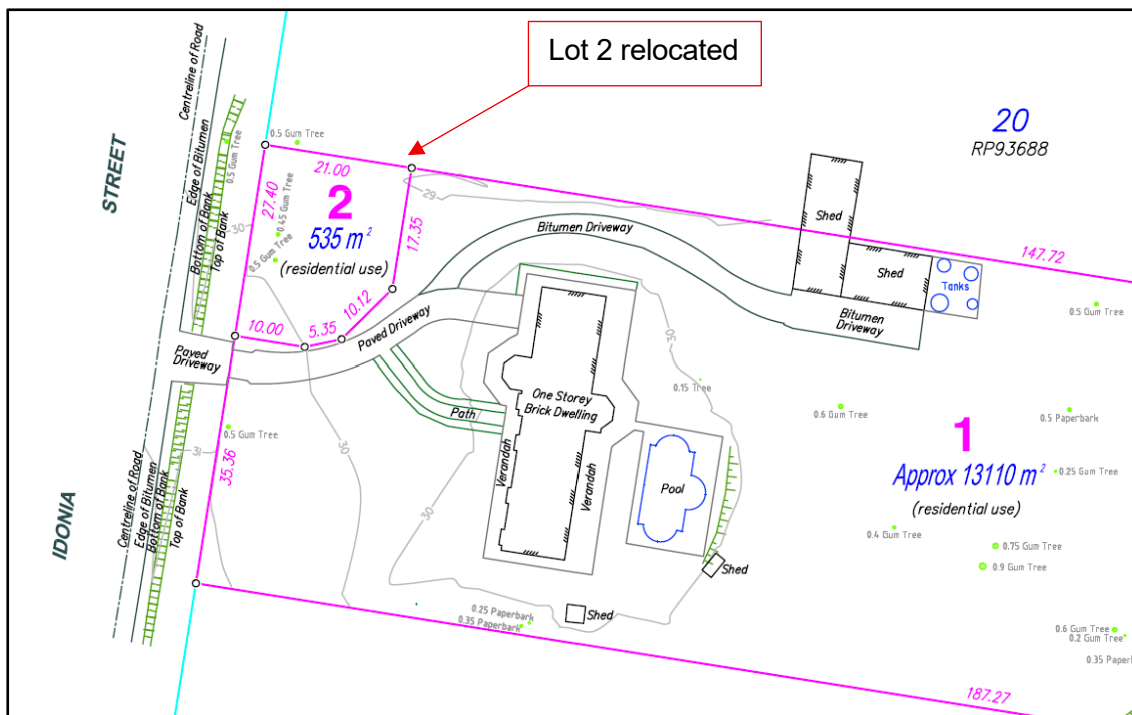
Proposed Plan of Subdivision (Source: Lawson Surveys)
